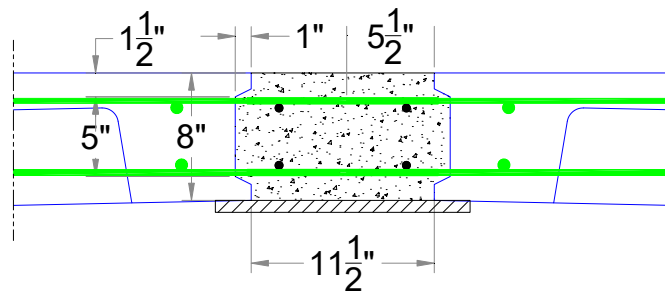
Section View of the Proposed UHPC Longitudinal Joint
